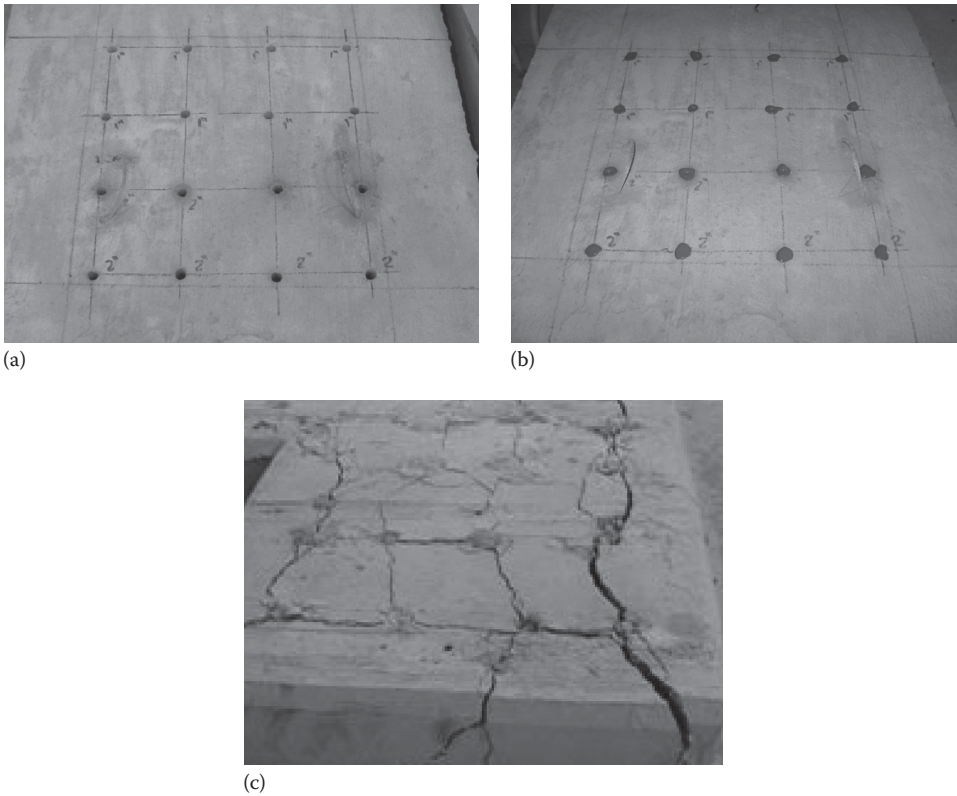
Demonstrating photos of the use of an expansive demolition agent. (a) Holes drilled on a marked grid. (b) Holes filled with grout. (c) Concrete splitting.
